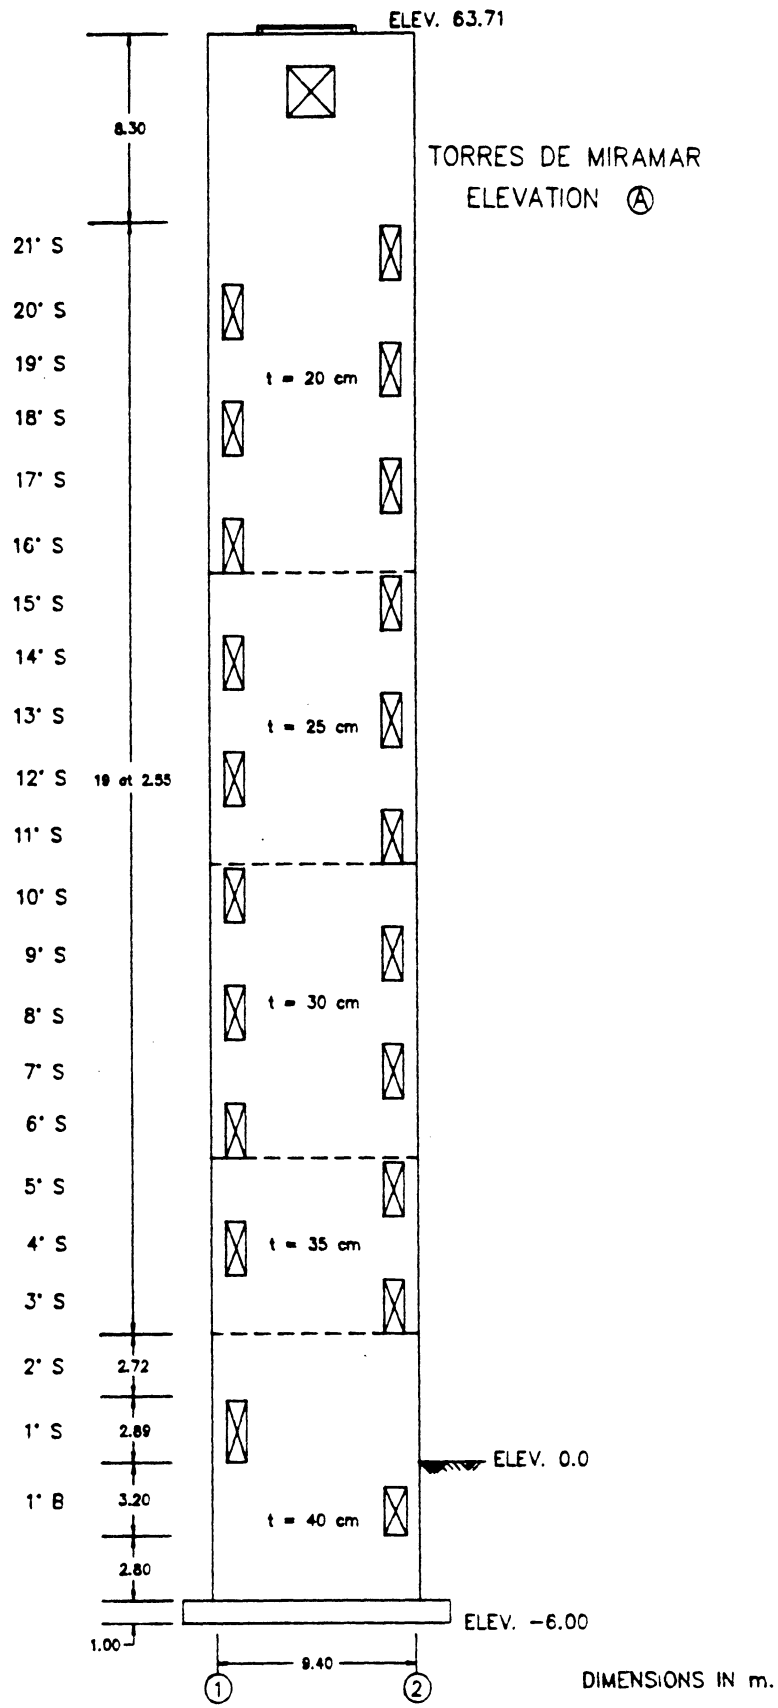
(b) : Elevation along Wall A of Miramar Building.
